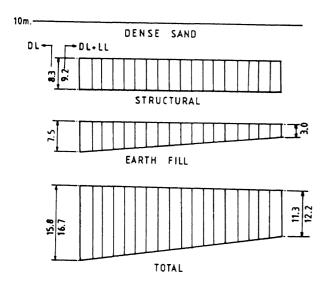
Foundation Pressure Building $4(t/m^2)$
